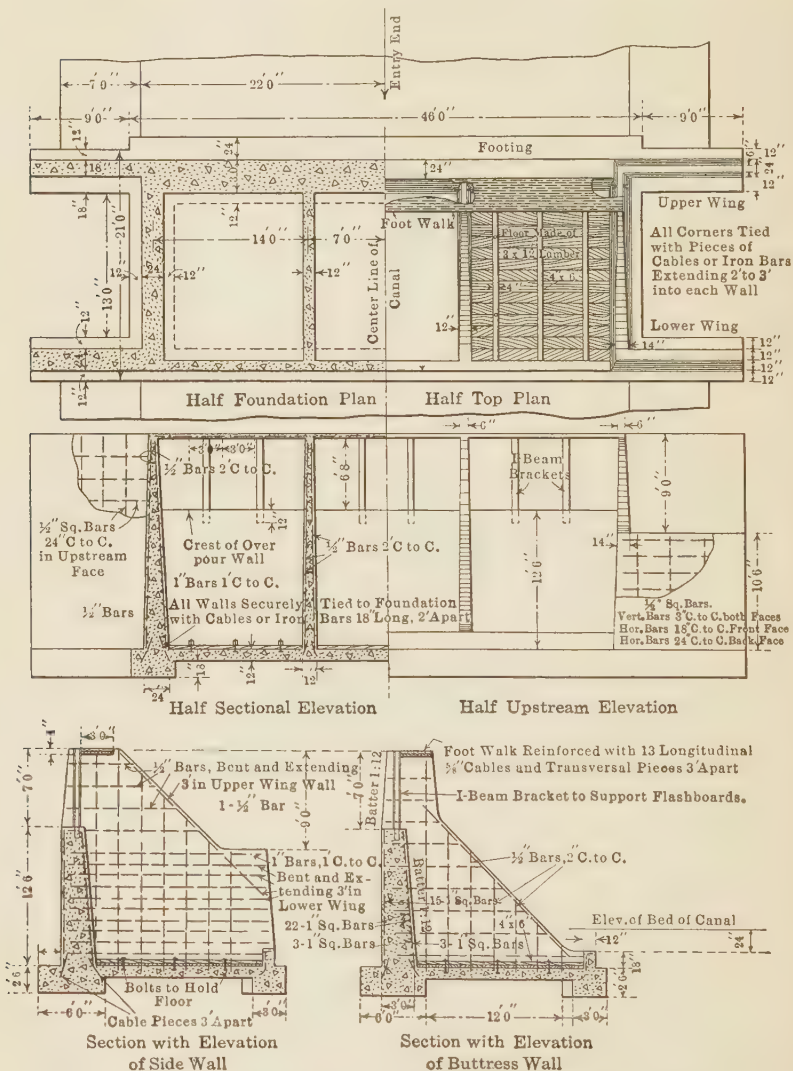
Reinforced concrete drop. Modesto Irrigation District, Calif.
